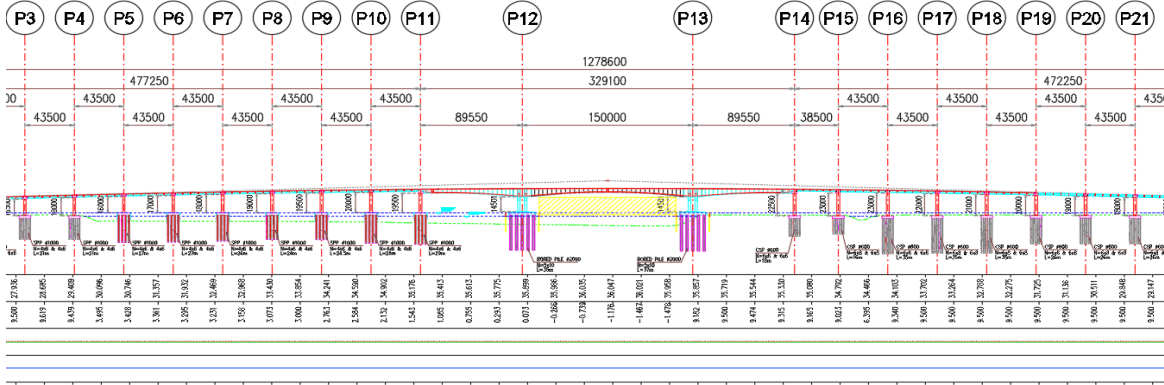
Longitudinal Profile Balanced Cantilever Bridge
